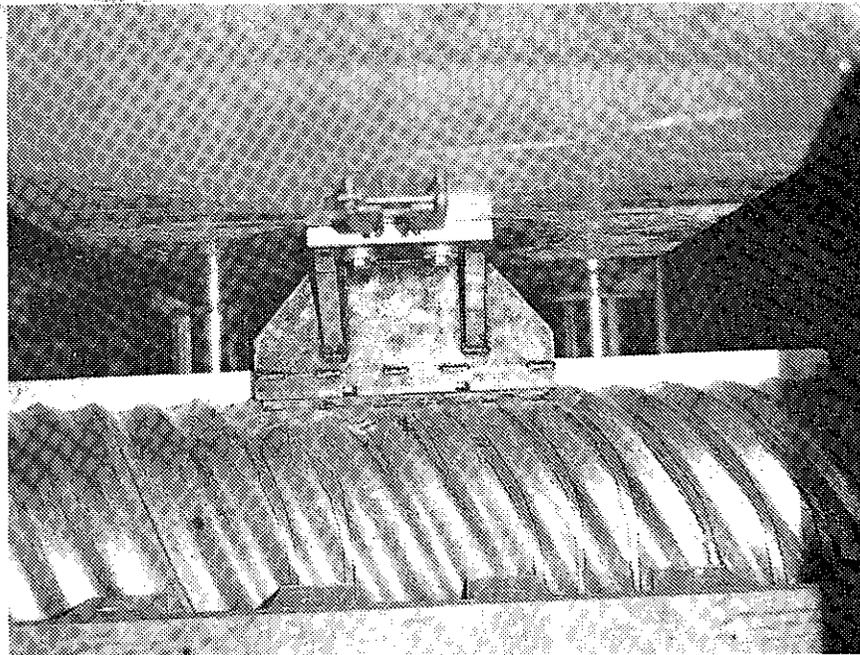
LOADING METHOD (1): ECCENTRIC LOADING APPLIED TO A ROD, TACK-WELDED TO CORRUGATED PIPE OF SLOTTED DRAIN.
